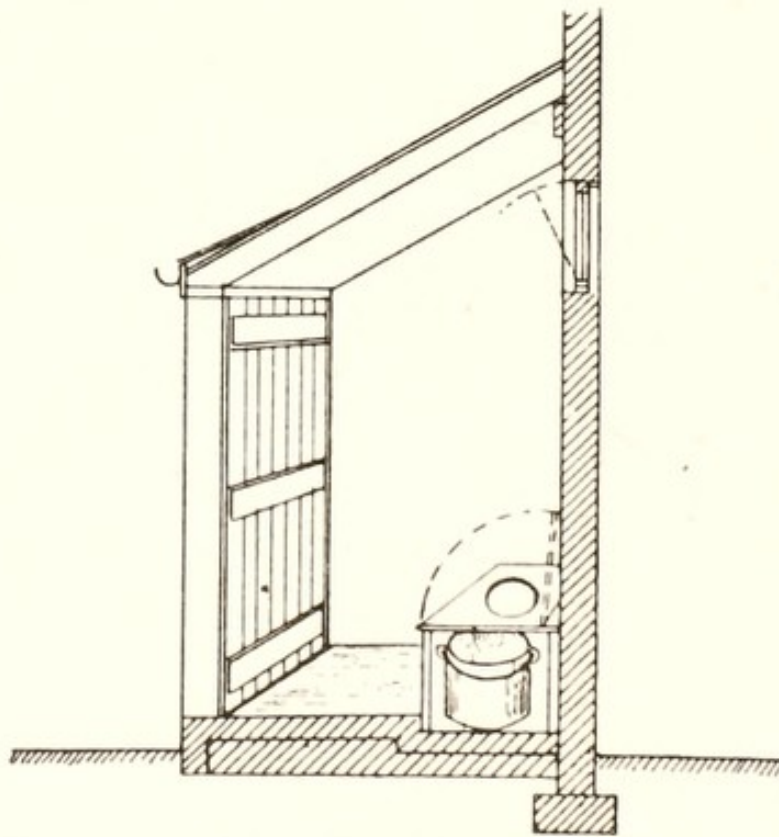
A WELL - CONSTRUCTED PRIVY,
